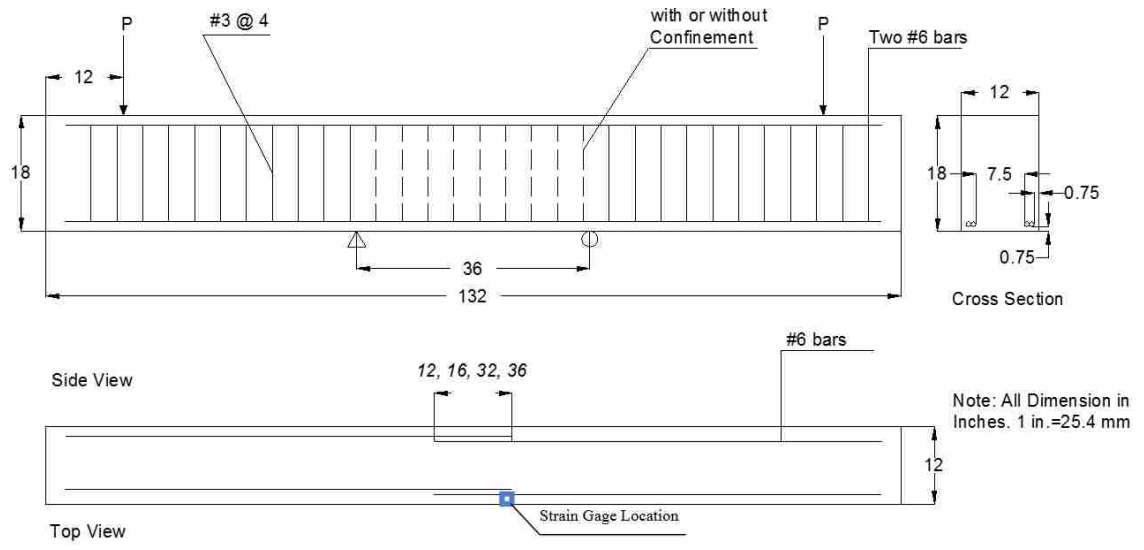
Details of Beam Specimens with No. 19 (#6) Rebar Splices
